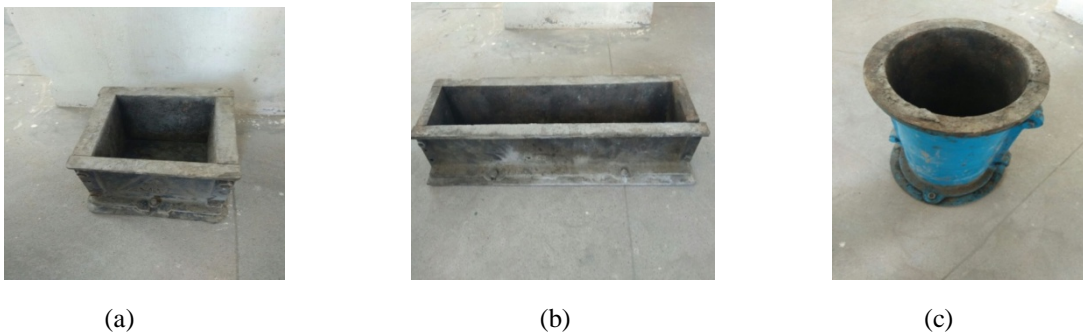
a) Cube mould, b) Prism mould, c) Cylinder mould
